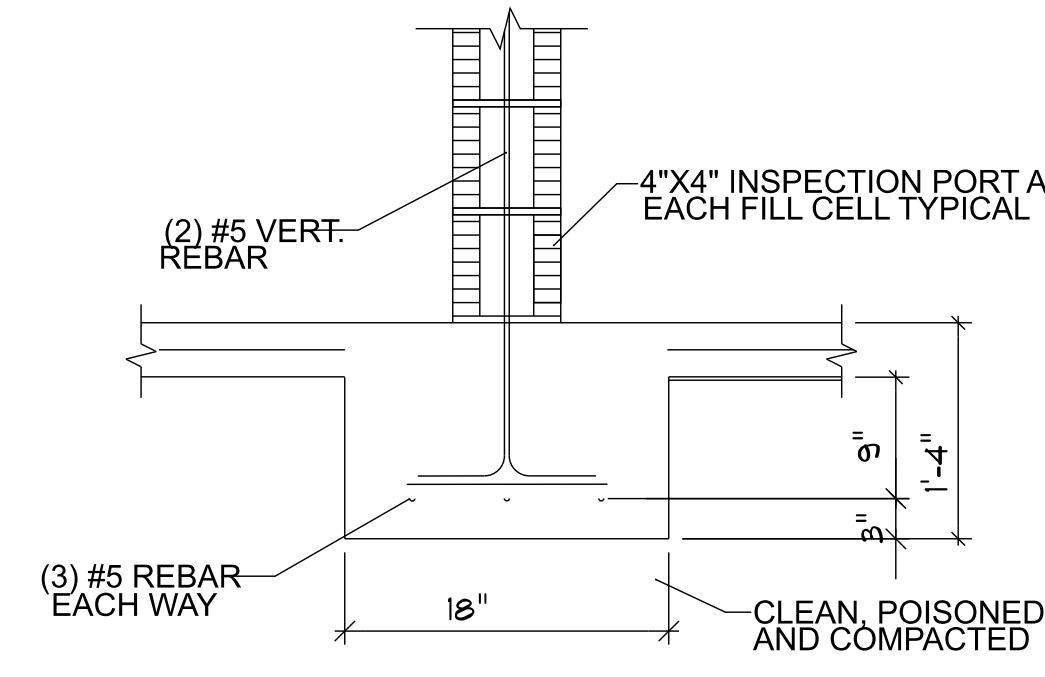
ALTERNATIVE FOOTING DETAIL
